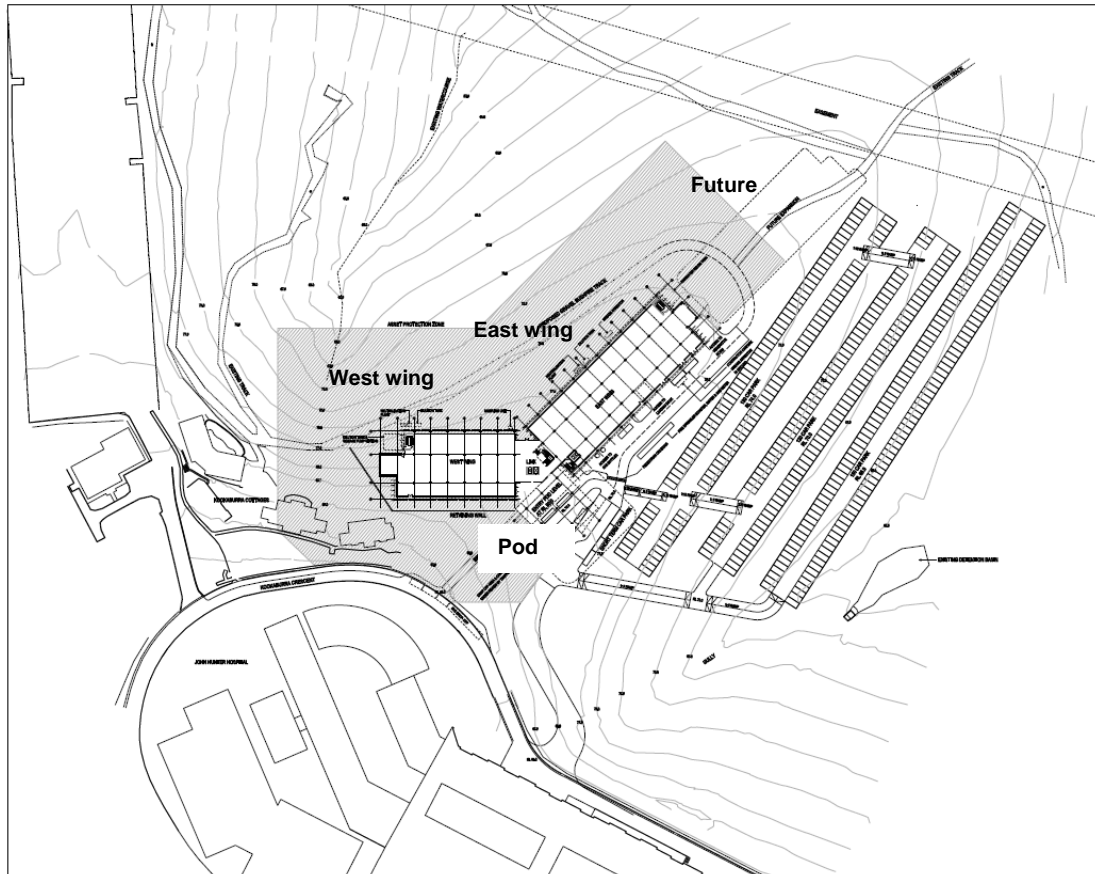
Site Layout Plan of proposed HMRI buildings at Rankin Park Campus
